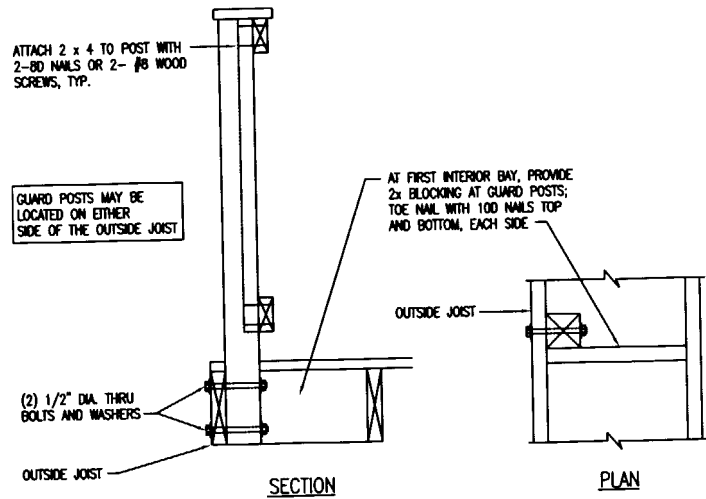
GUARD POST TO OUTSIDE JOIST DETAIL
